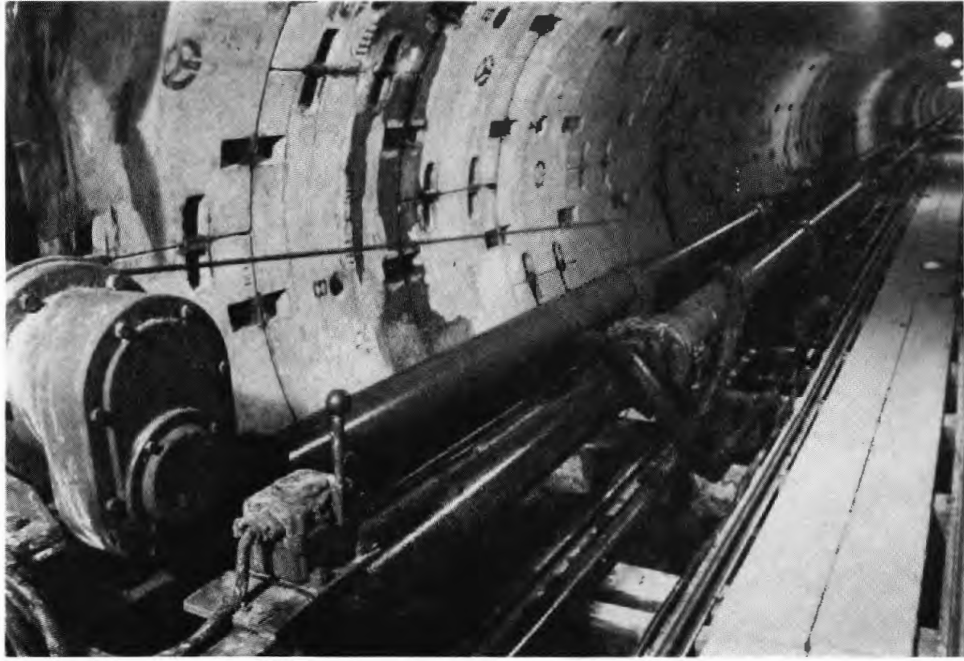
FINISHED TUNNEL WITH PRECAST CONCRETE LINER SEGMENTS AND SLURRY LINES FOR MUCK TRANSPORT (PHOTOGRAPH COURTESY OF SATO KOGYO CONSTRUCTION CO.).
